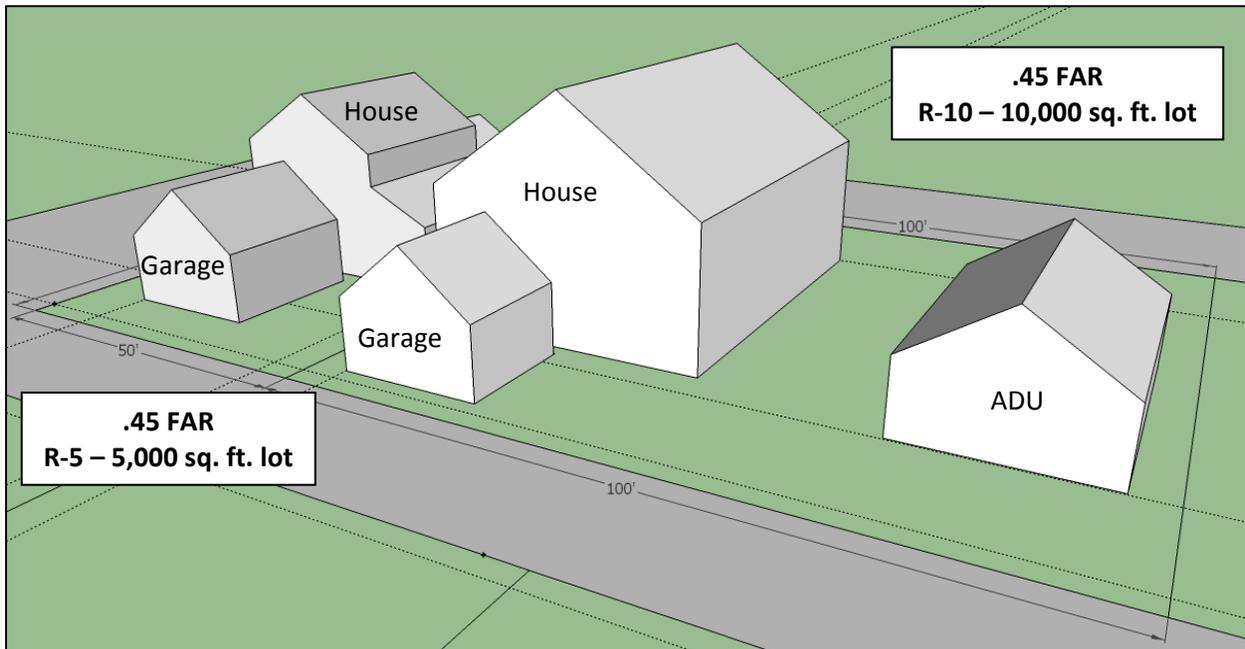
Alley/Rear Elevation showing the FAR limits for R-5 and R-10 zoned properties.
